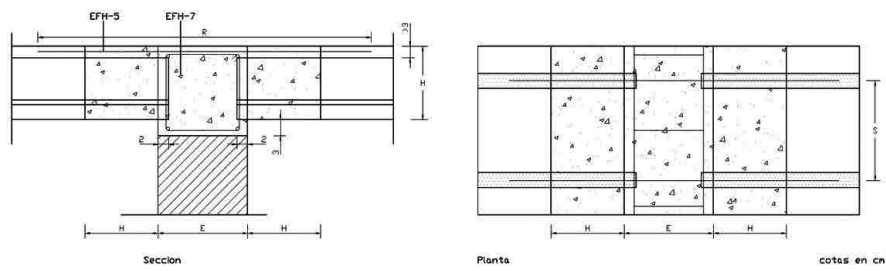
Double support on masonry work In NTE (Normas Tecnológicas de la Edificación).
